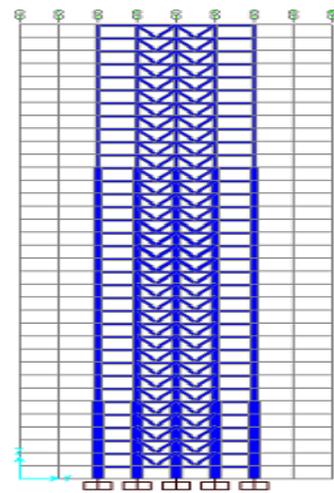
Elevation of 35 storey model showing V-braces in two central bays at outer periphery.
